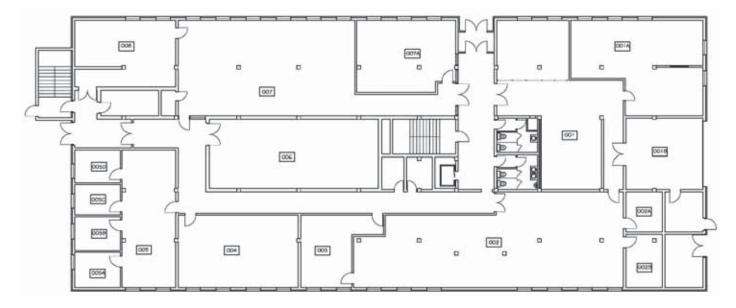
Basement floor plan from June 2008 Floor Plan drawings, Sheet A-1 (N.T.S.)
